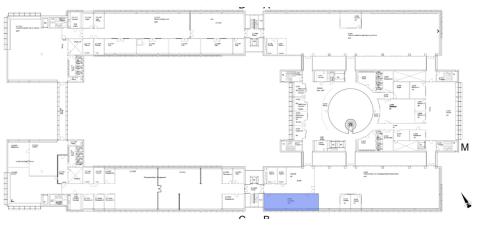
Building A second floor plan view - Aalborg University Copenhagen campus (silent study room delimited by the blue part)
